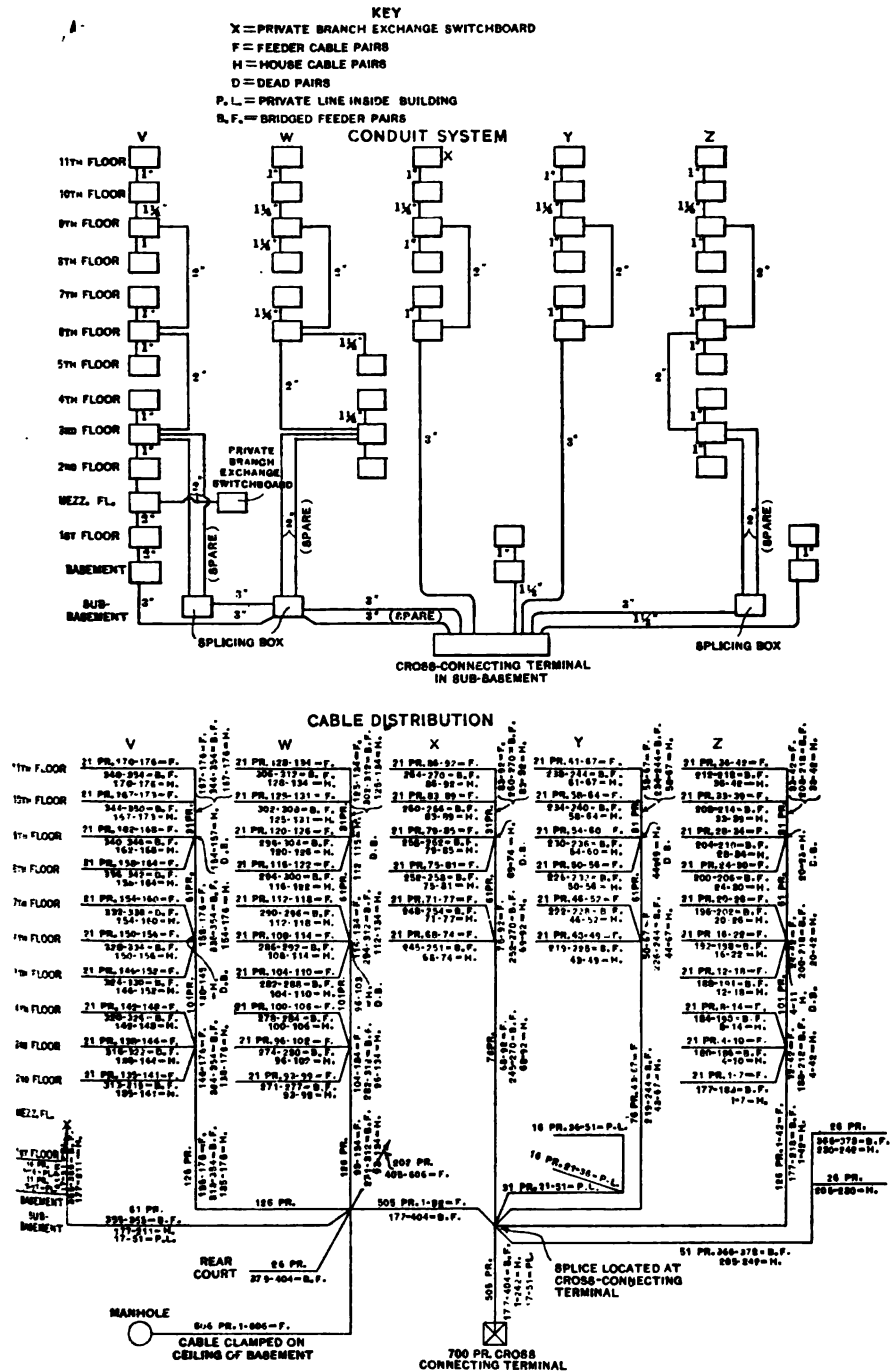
11-STORY OFFICE BUILDING, CONDUIT SYSTEM AND CABLE DISTRIBUTION.
